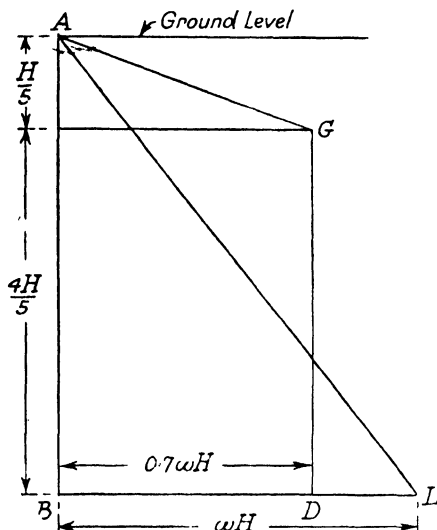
Illustrating Terzaghi's semi-empirical rule for distribution of earth pressure on a retaining wall.
